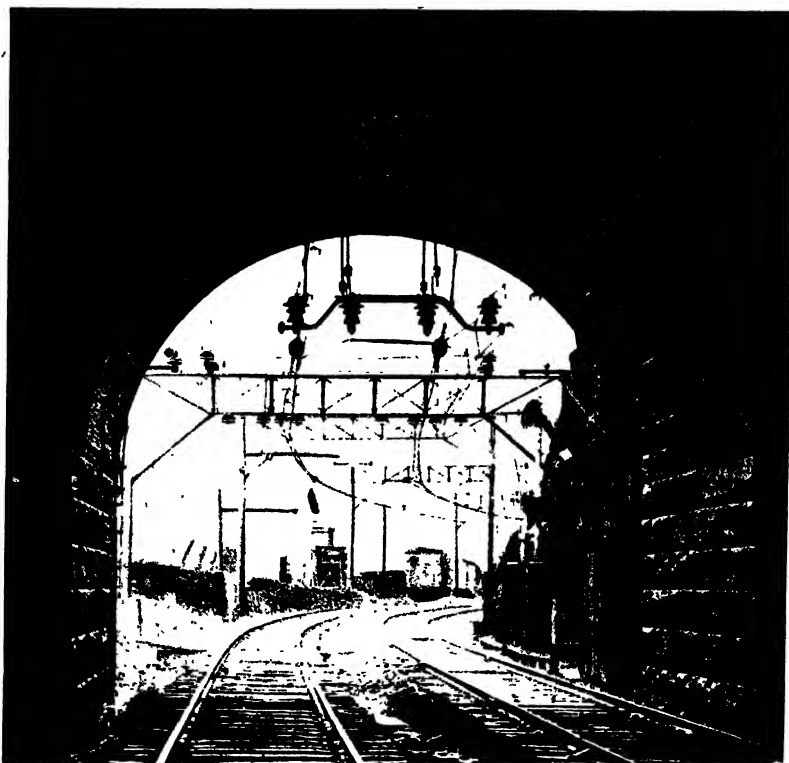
Construction at Hoosac Tunnel (Boston and Maine R.R.).
